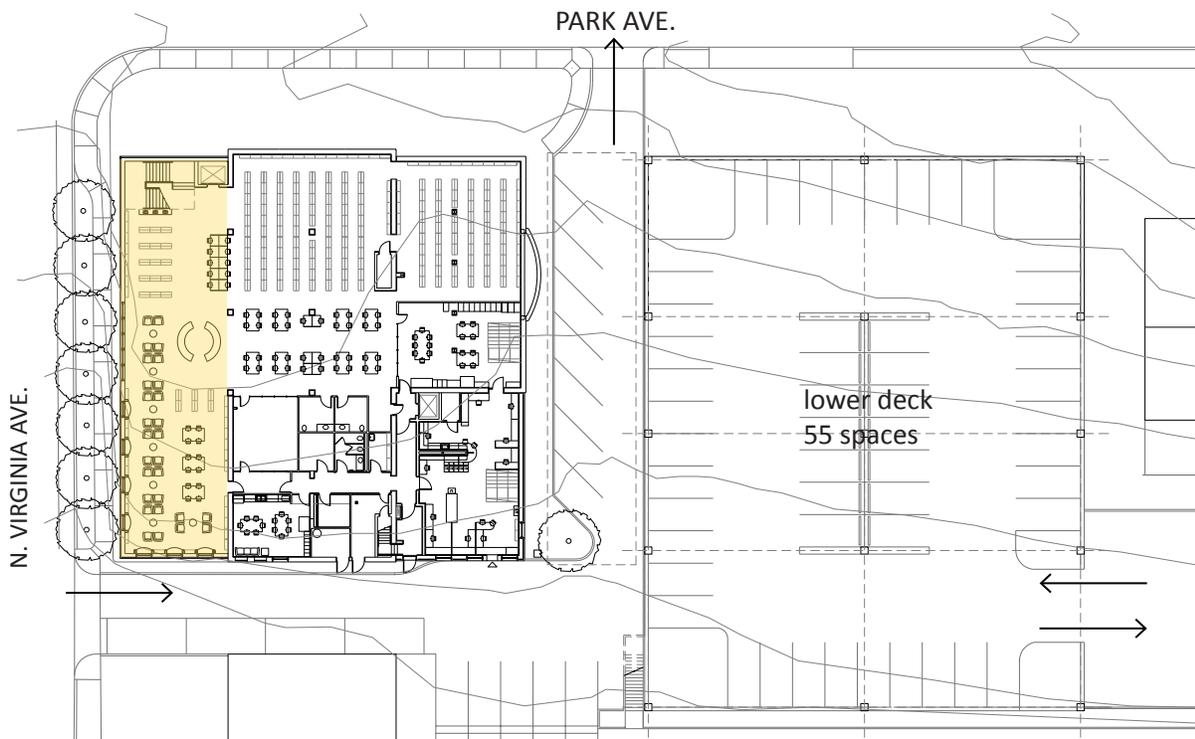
West Expansion Lower Level Plan + Parking Deck
